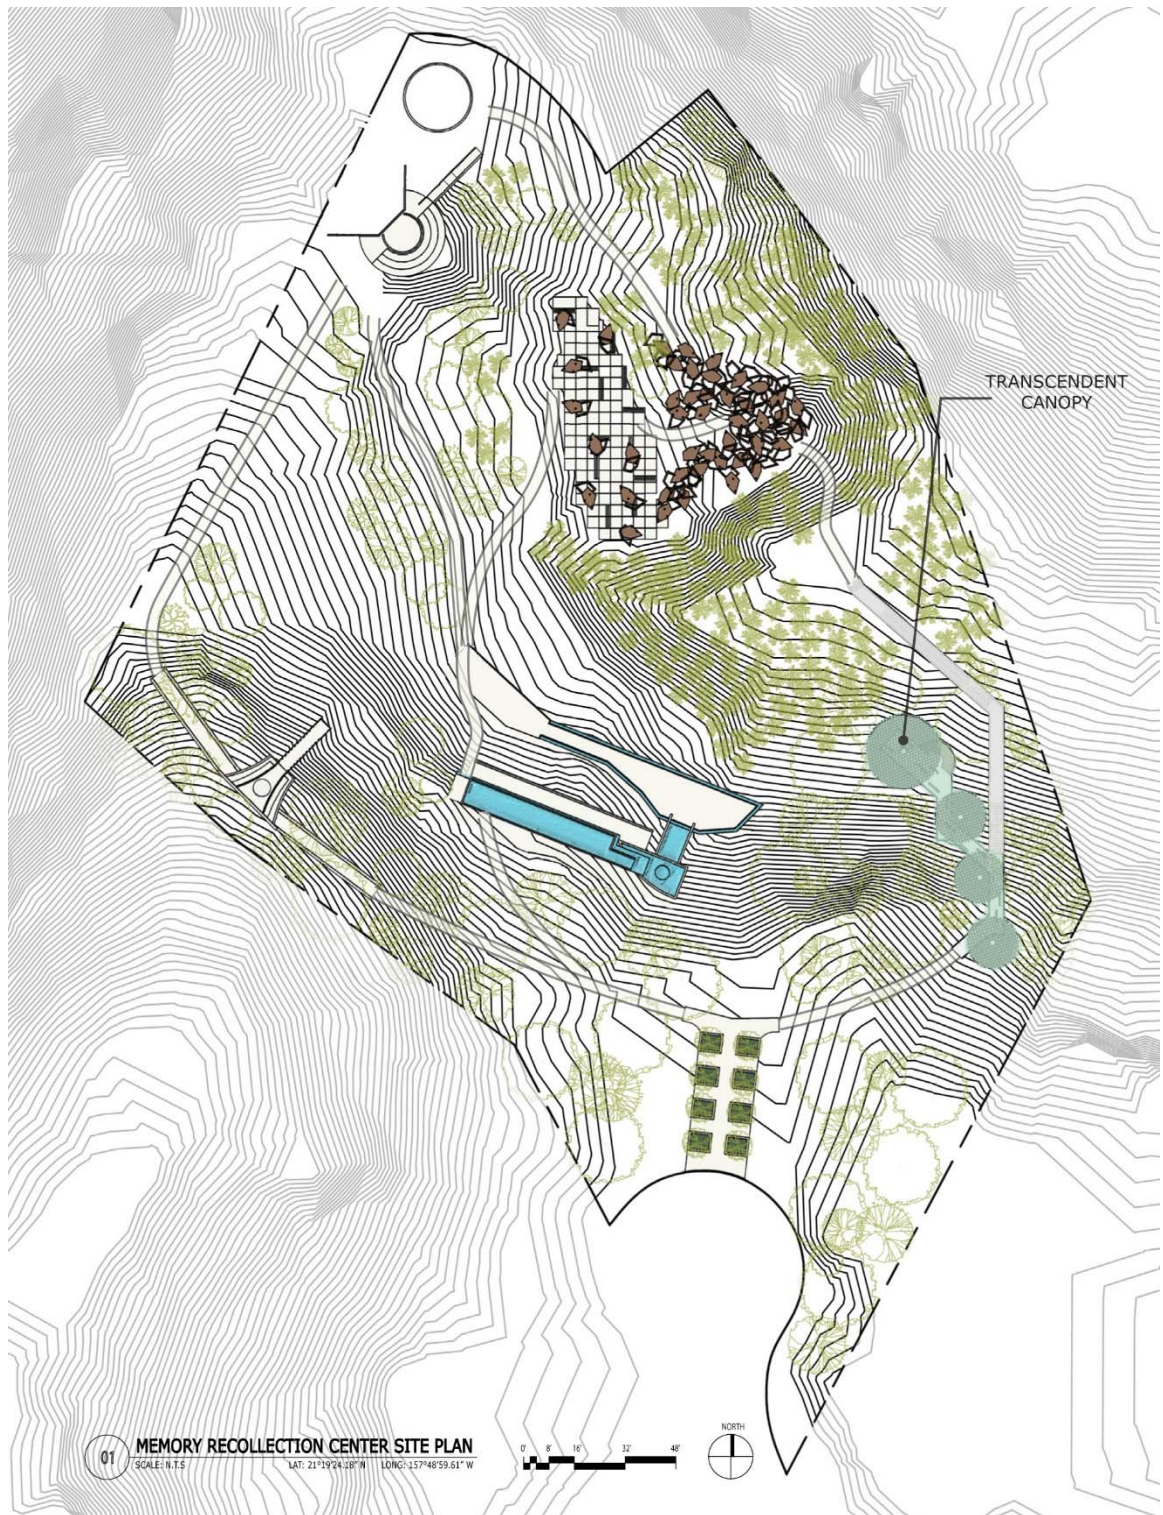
Memory Recollection Center Site Plan Indicating Location of Transcendent Canopy. Made by Author
